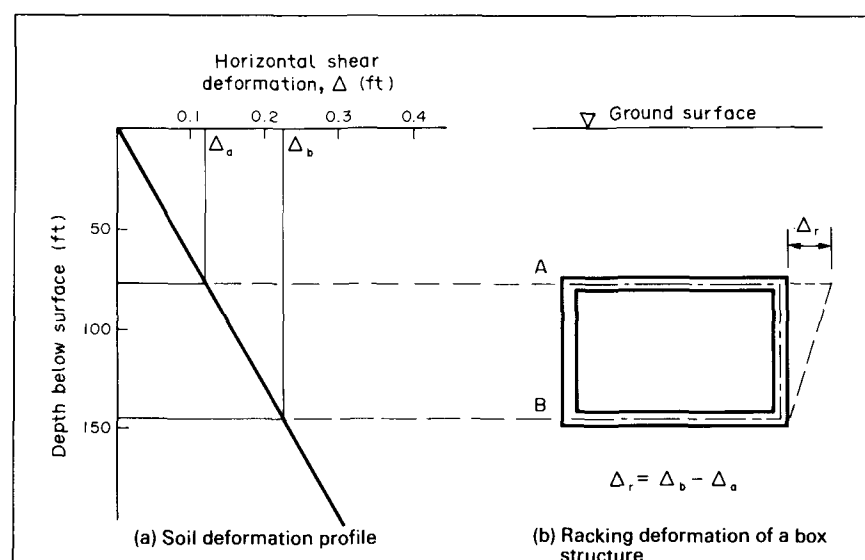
Typical soil deformation profile and racking imposed on an underground structure during an earthquake.
